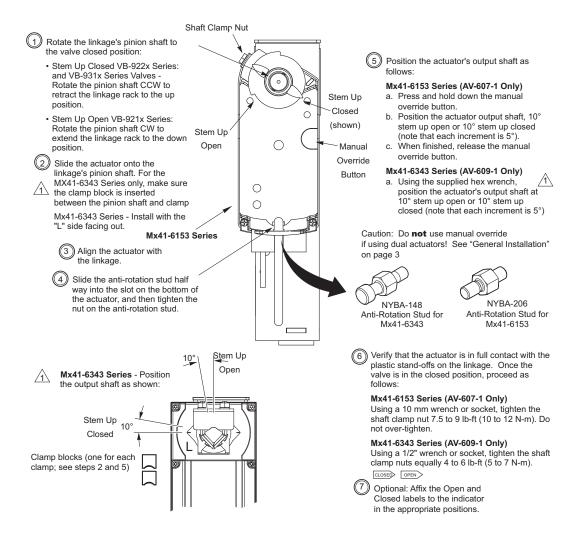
Mounting Mx41-6153 Series or Mx41-634x Series Actuator and Setting Up Actuator/Linkage/Valve
